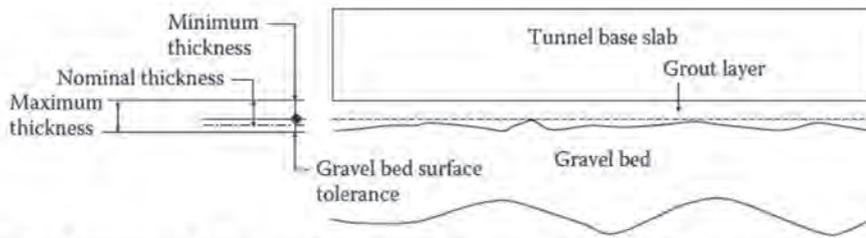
Arrangement of a grouted bed (ref : Immersed Tunnels, Lunniss/Baber).
